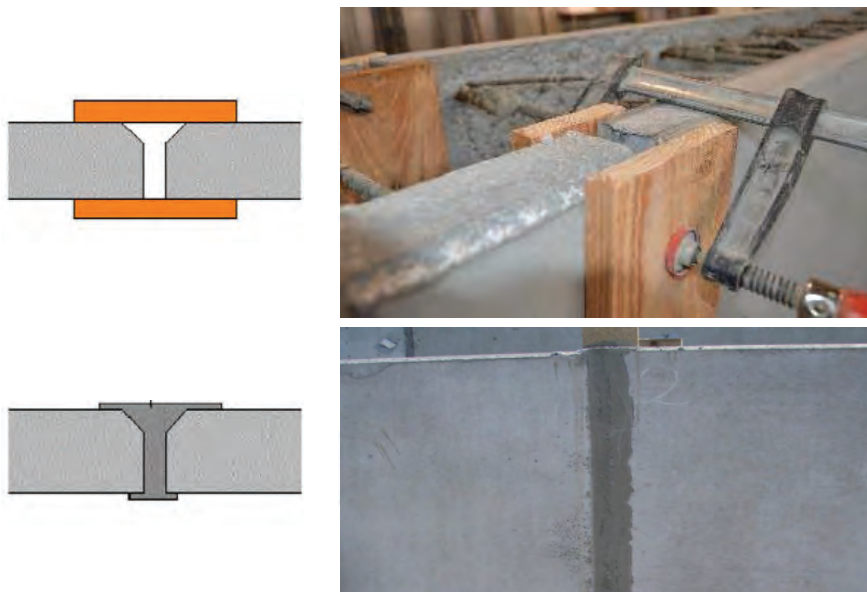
Joints between thin-walled precast concrete elements according to Wimmer (2016)
